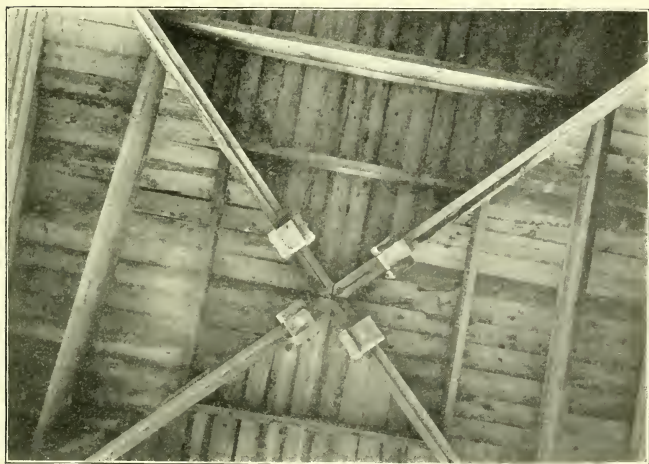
UNDER SIDE OF ROOF CENTERING, SHOWING CLAMPS CONNECTING FOUR QUARTER SECTIONS.
